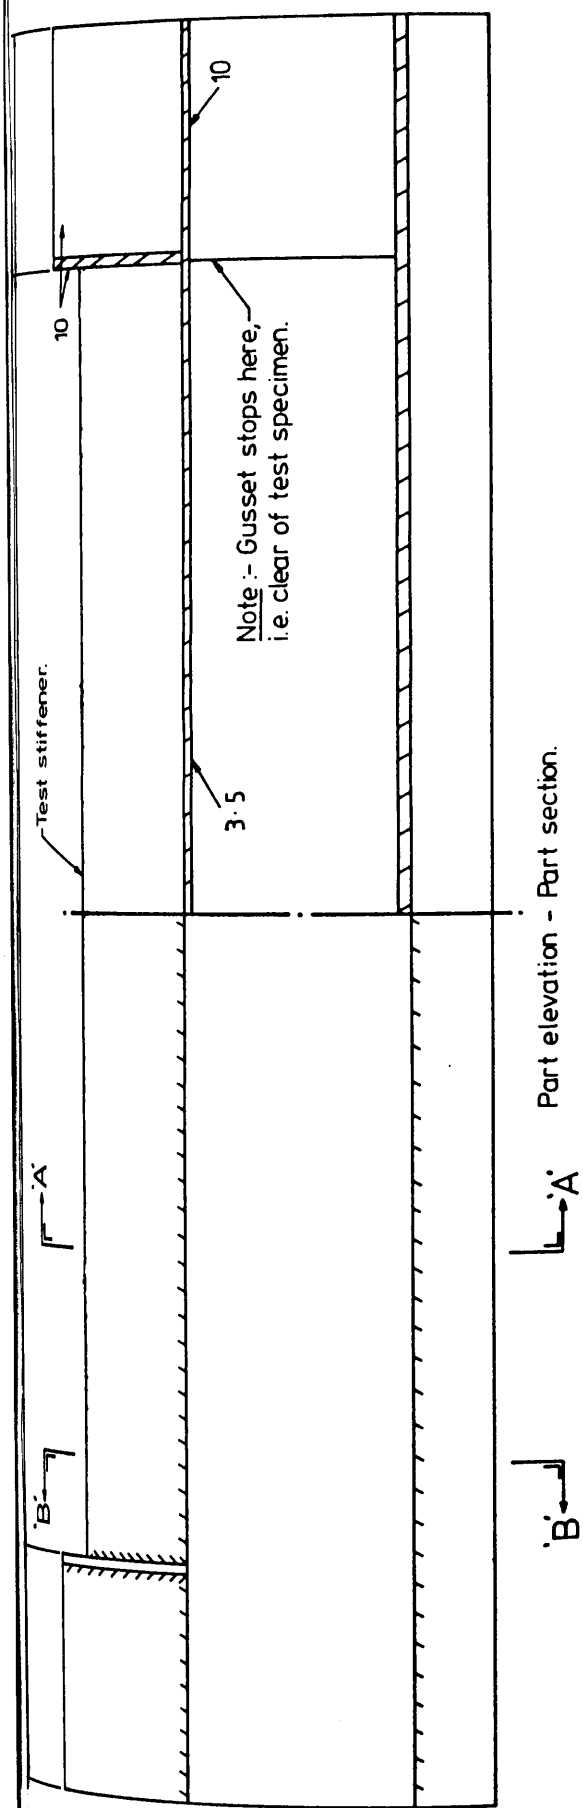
ELEVATION/LONGITUDINAL AND TRANSVERSE SECTIONS OF TEST MODELS
